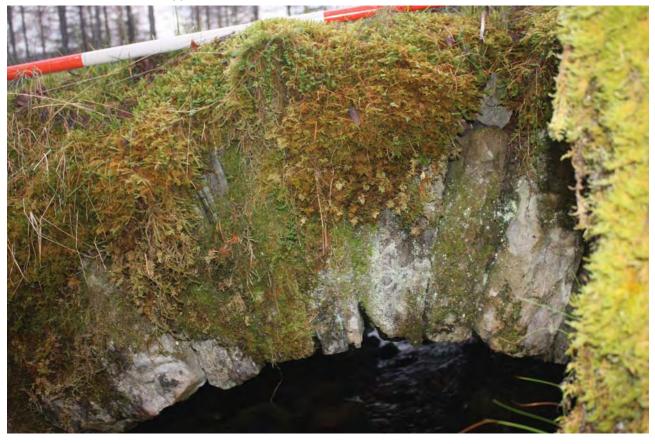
Bridge 008, detail of south side showing voussoir stones on the west side
